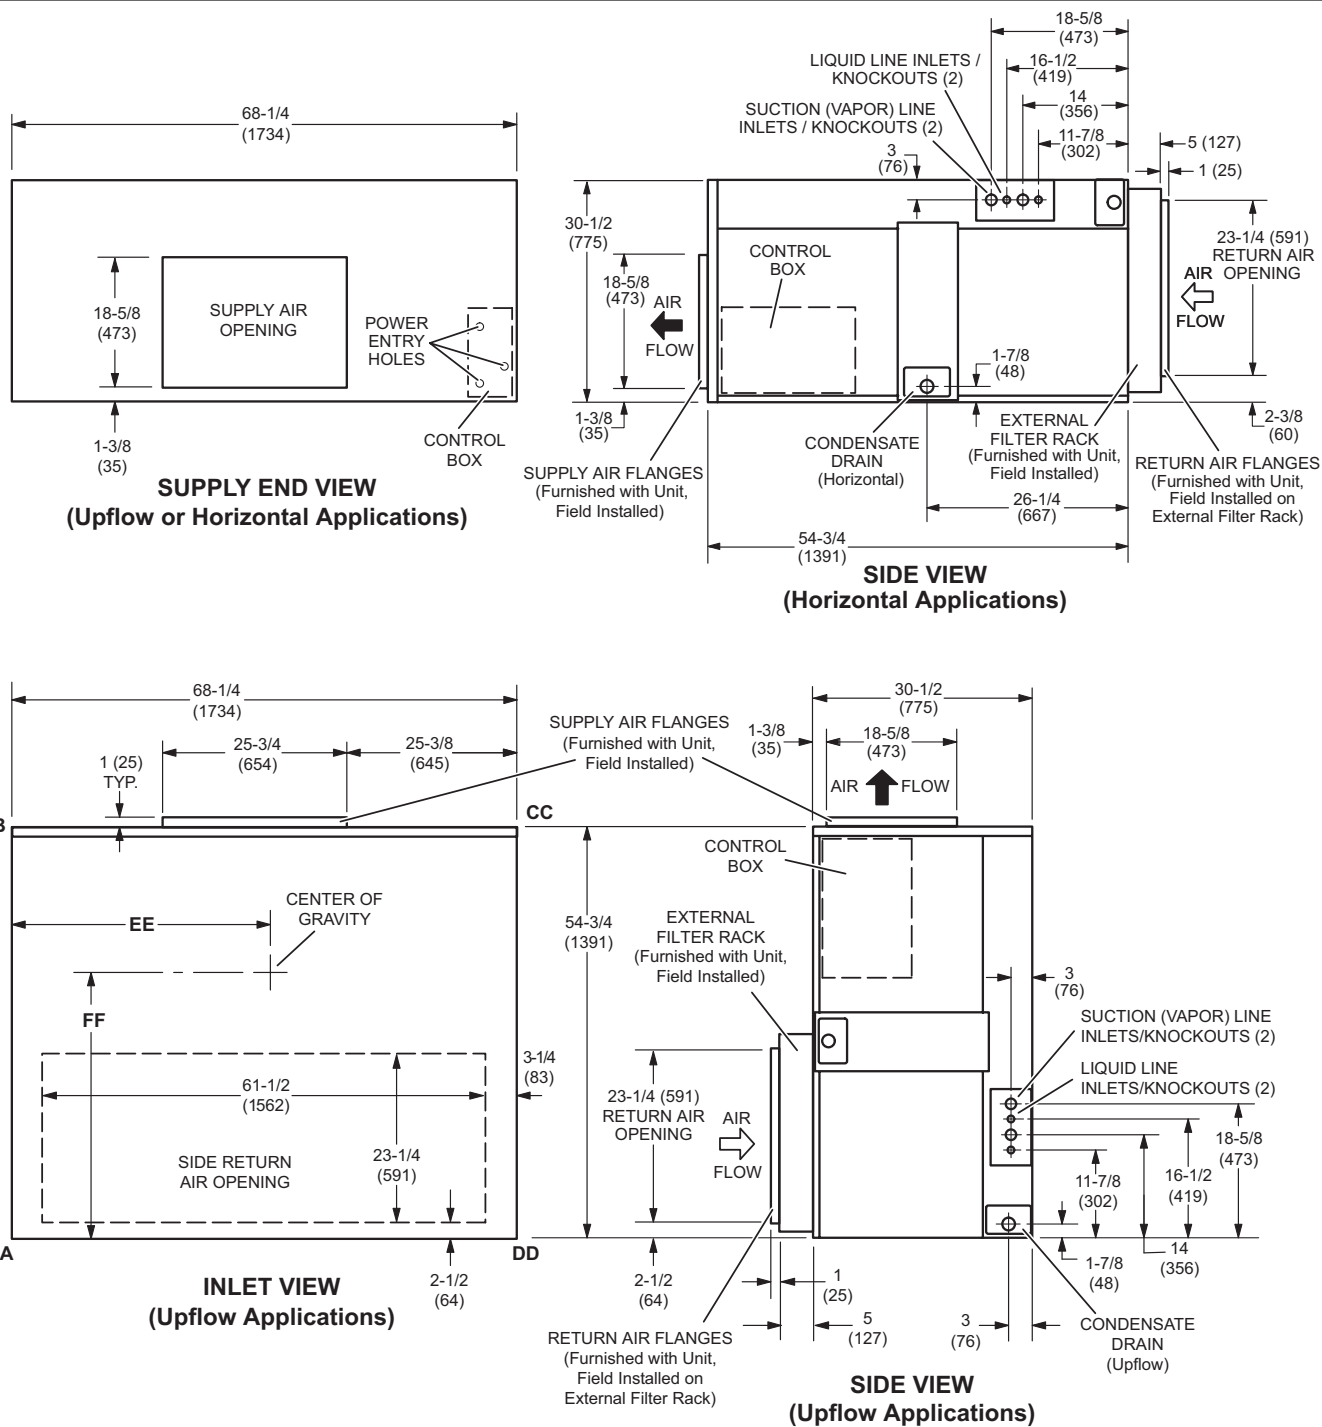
EL120-150KA Unit Dimensions – Inches (mm)
